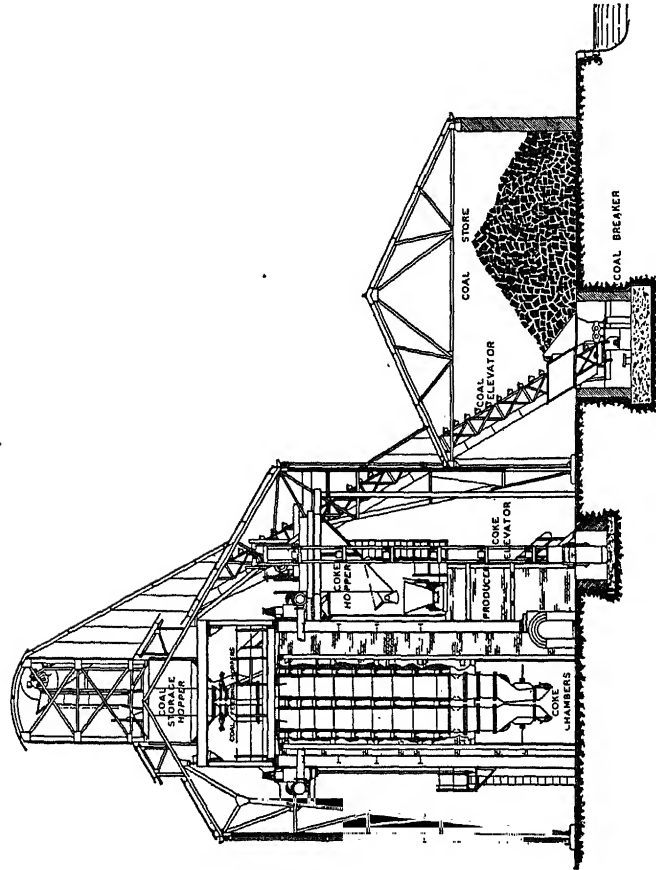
Sectional elevation of Glover-West vertical retort house and coal store.
